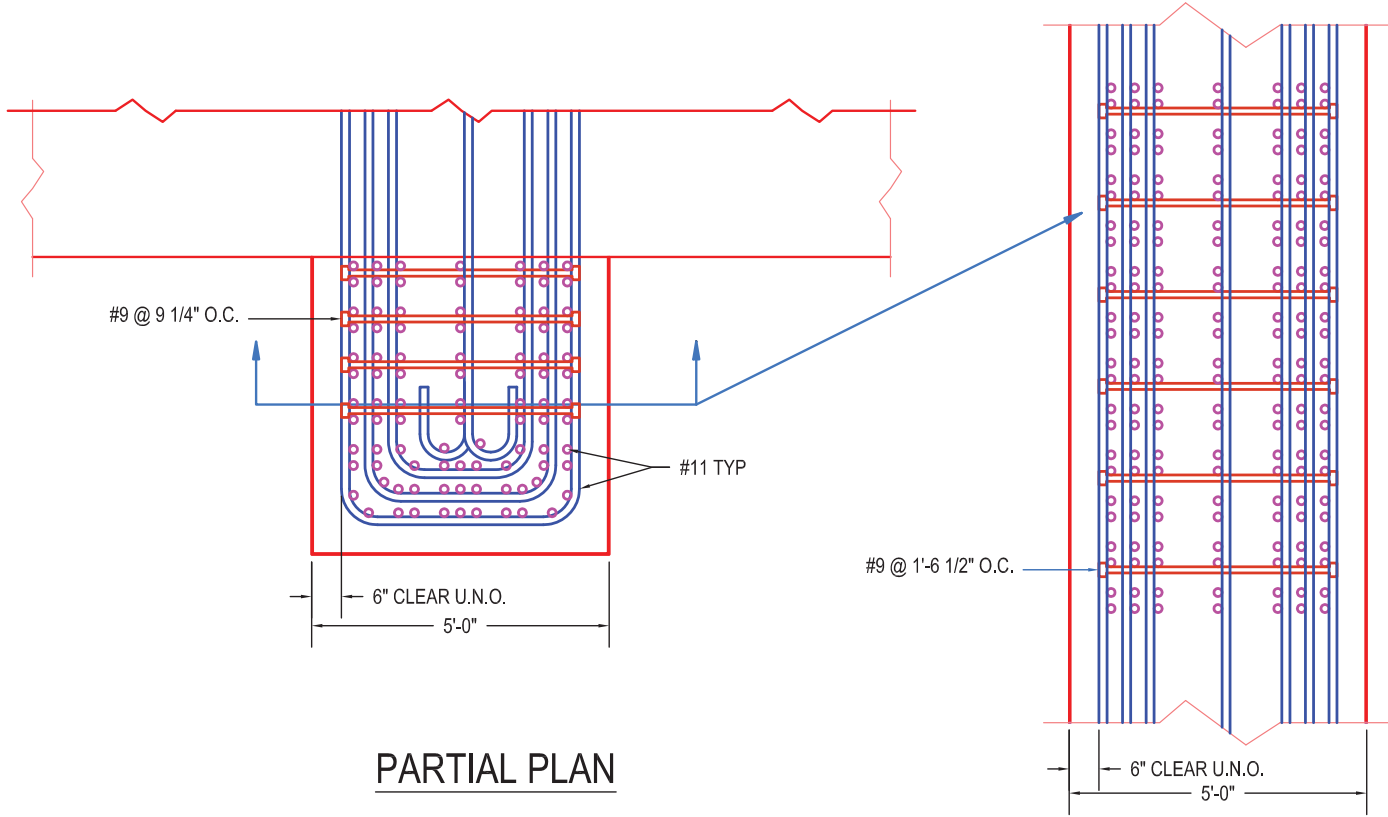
B-12: RXB Reinforcement Section View of Pool Weir Wall on Grid Line 3
